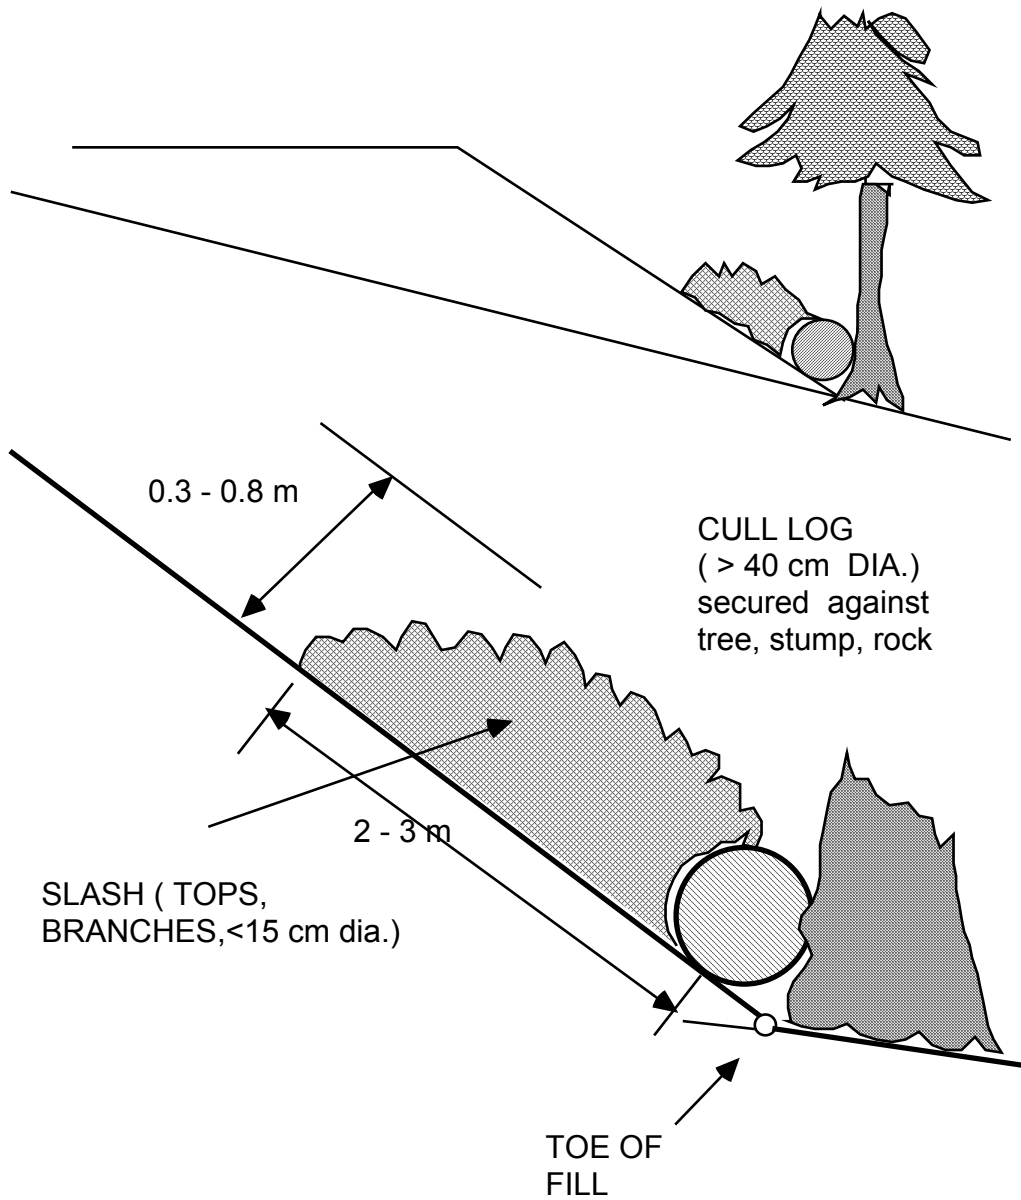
Typical filter window dimensions built of slash and placed on the fill slope immediately above the toe. The window should be compressed and the bottom part embedded 15 cm in the fill slope. (after Cook and King, 1983)
